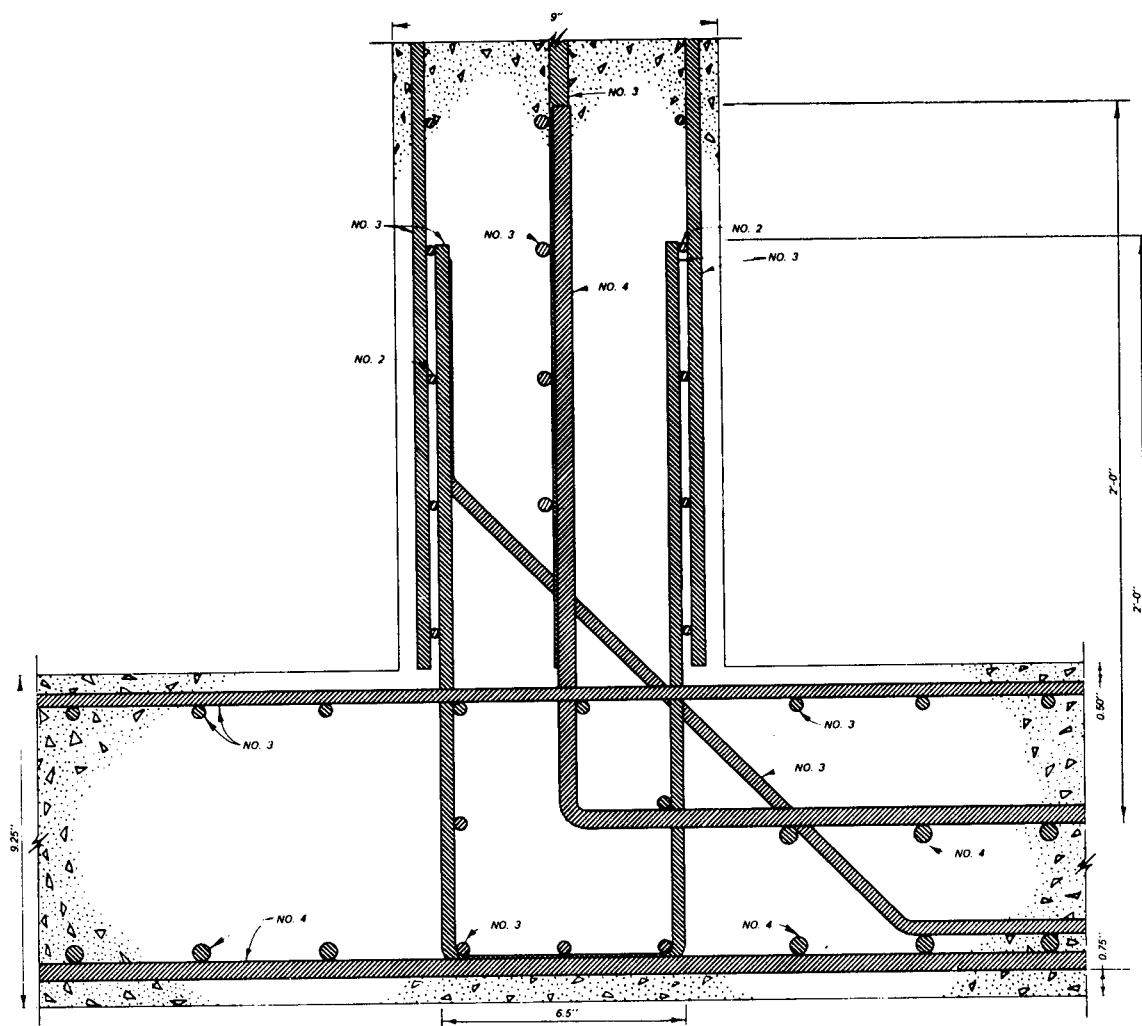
Elevation view, typical intersecting floor slab and wall detail (Sheet 6 of 6)
